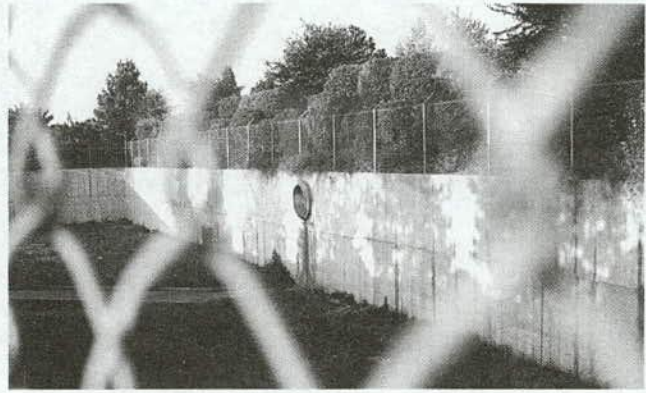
Vertical-walled dry pond serving a shopping mall.
